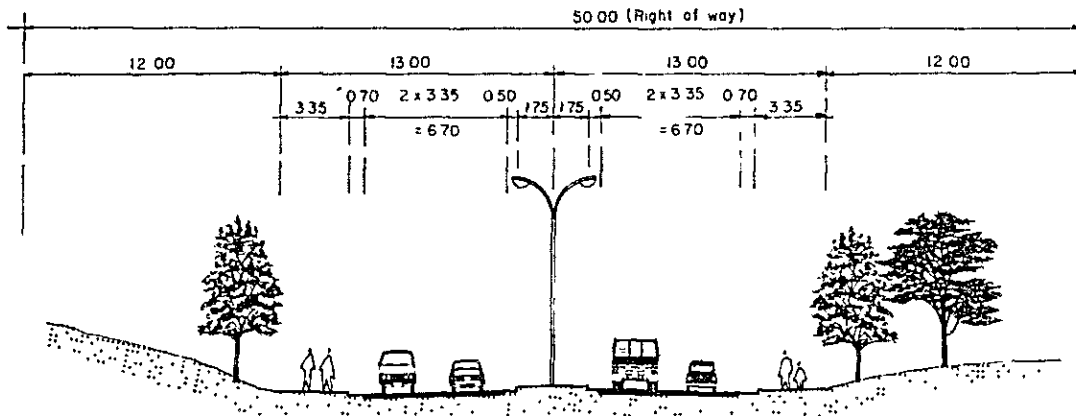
TYPICAL CROSS SECTION OF VIA EL PAICAL EXTENSION
